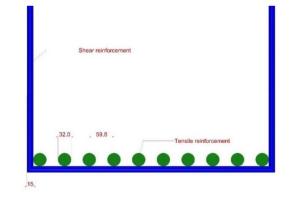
Cross section deck beam zoomed in. Units in mm.
